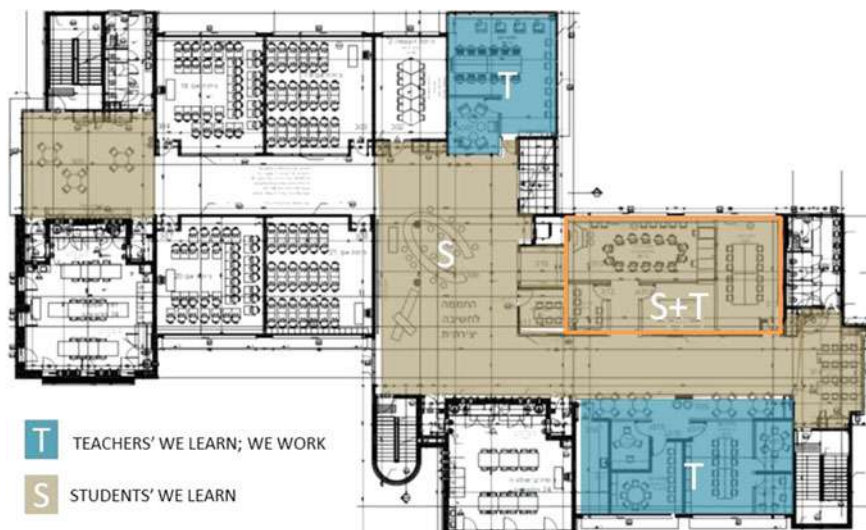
GT academic park: middle school 3rd floor; WEHUB plan
